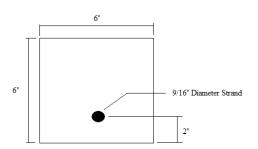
Cross section of the transfer length test beams (Trent 2007).
